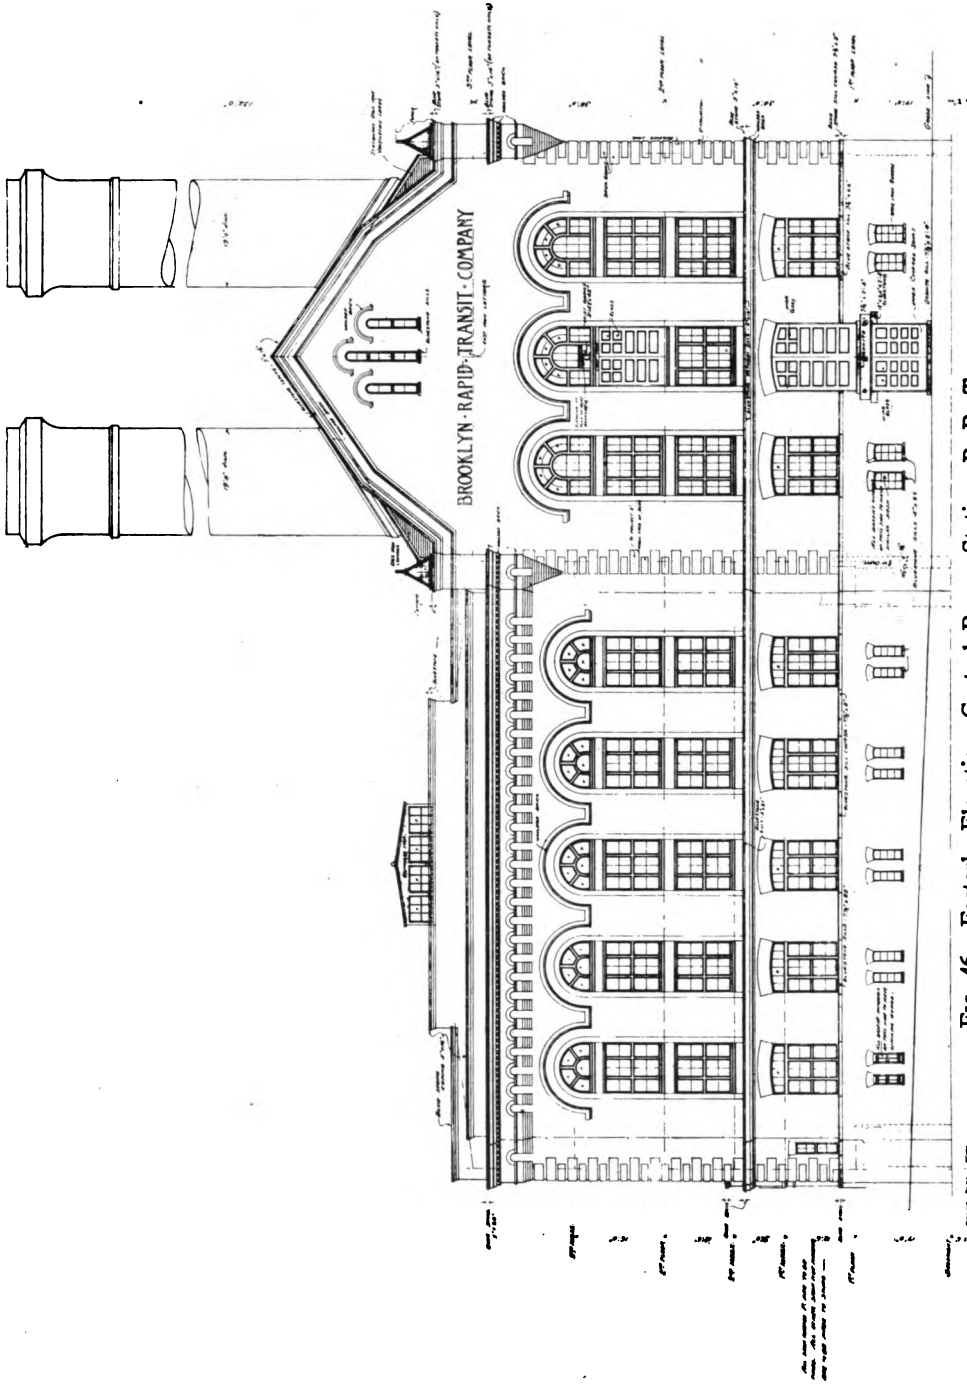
Easterly Elevation, Central Power Station, B. R. T.
